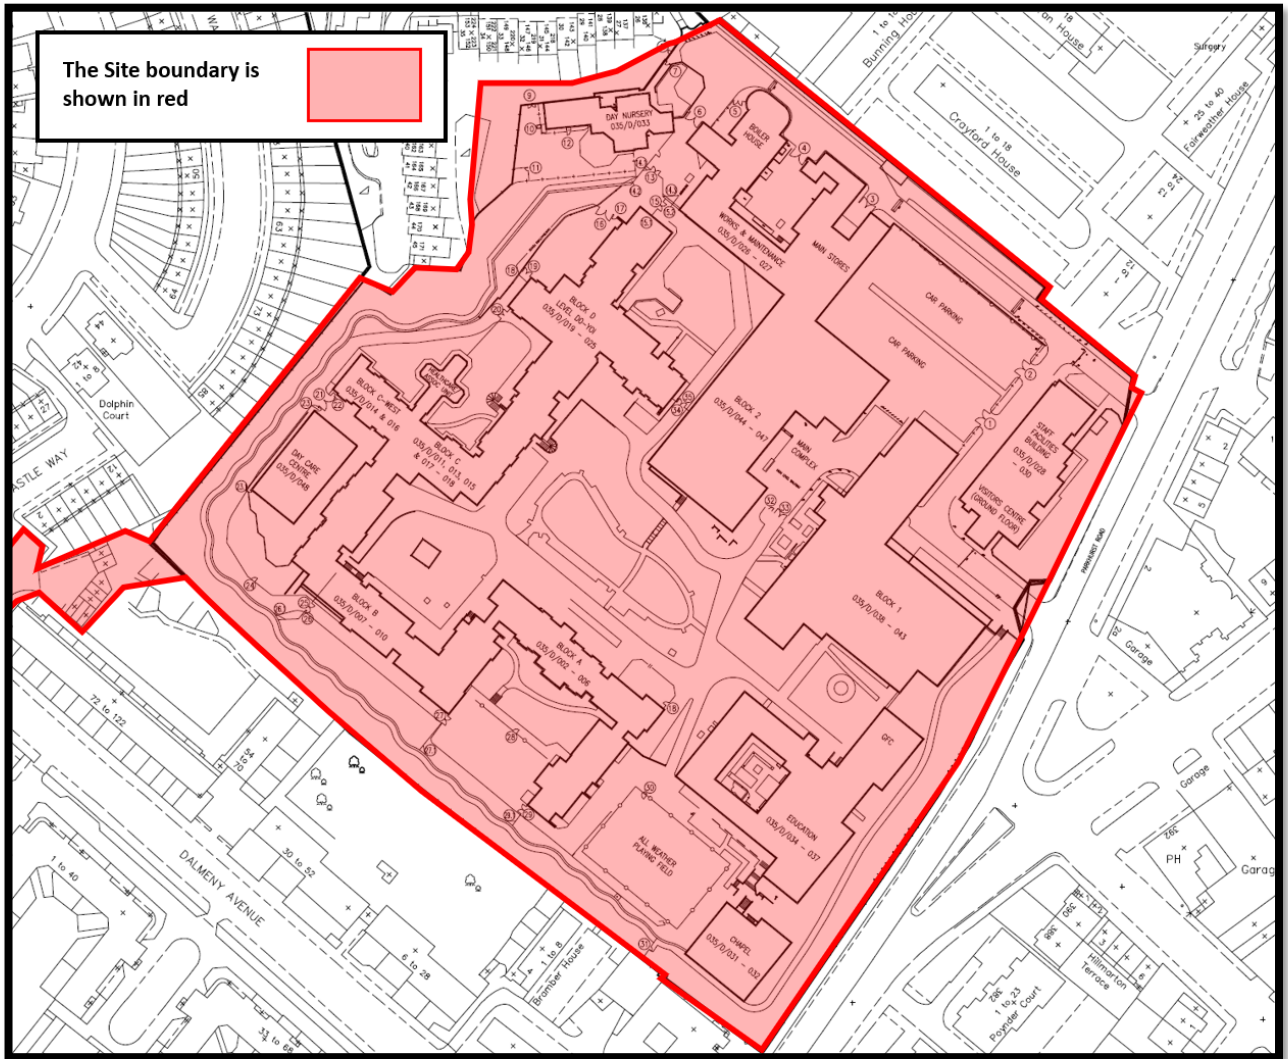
Plan of the Existing Internal Layout and Land Uses
